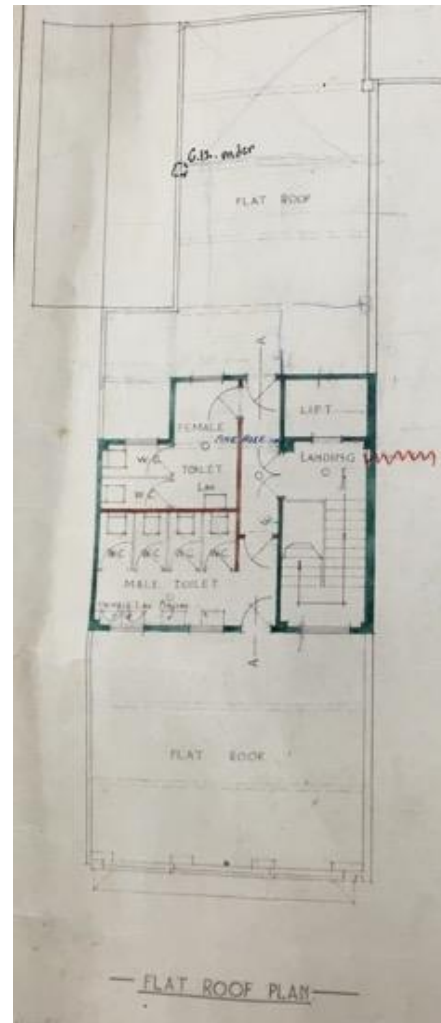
Original building plan with the 1927 addition of a concrete room on the roof drawn over top. (Source: PROV VPRS 11201/P1 unit 99, item 7871)
